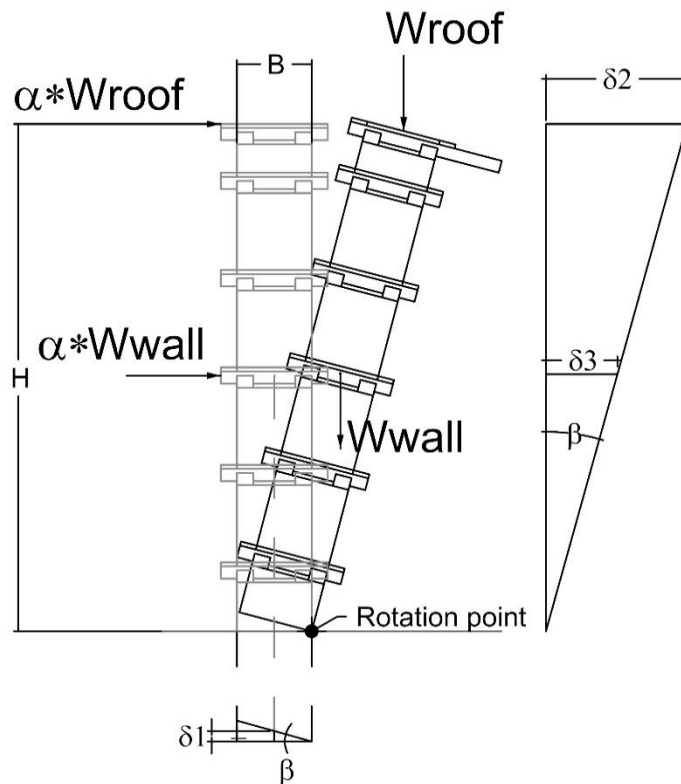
Roof force + Wall force - Overturning Wall - α critical
